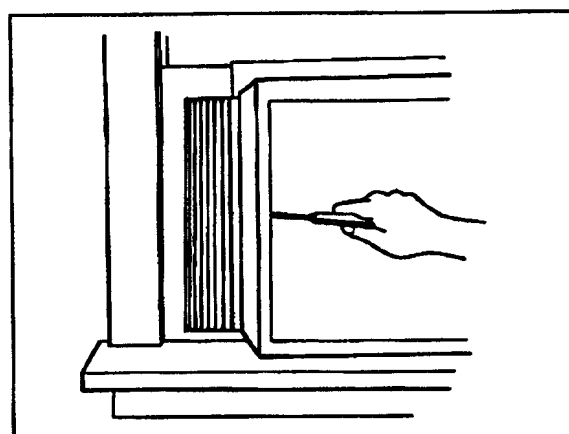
Fastening Wing Panels Against Sides of Casing
